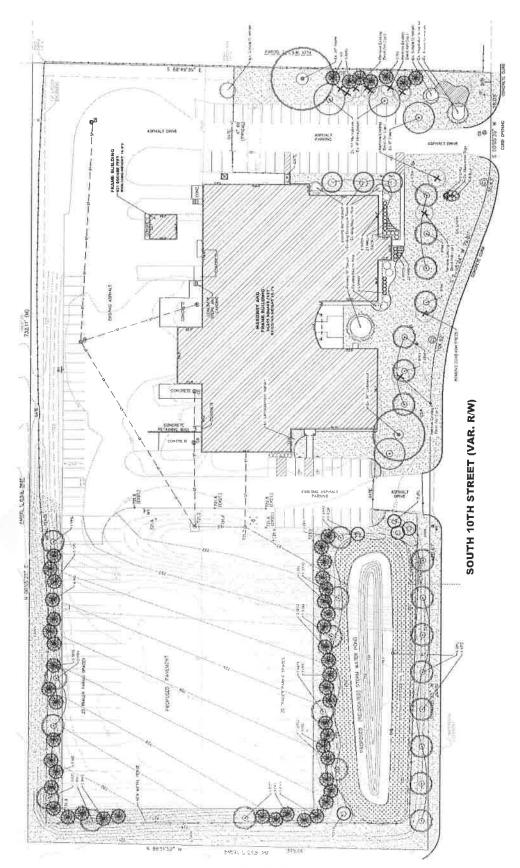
EXHIBIT A CONT'D: CONCEPTUAL SITE PLAN (ENLARGED)
